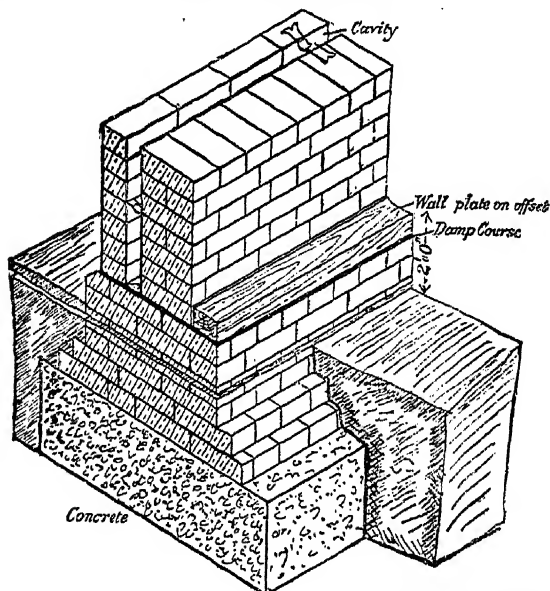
Sketch of Cavity Wall, showing Concrete Foundation, Damp-proof Course, etc.
